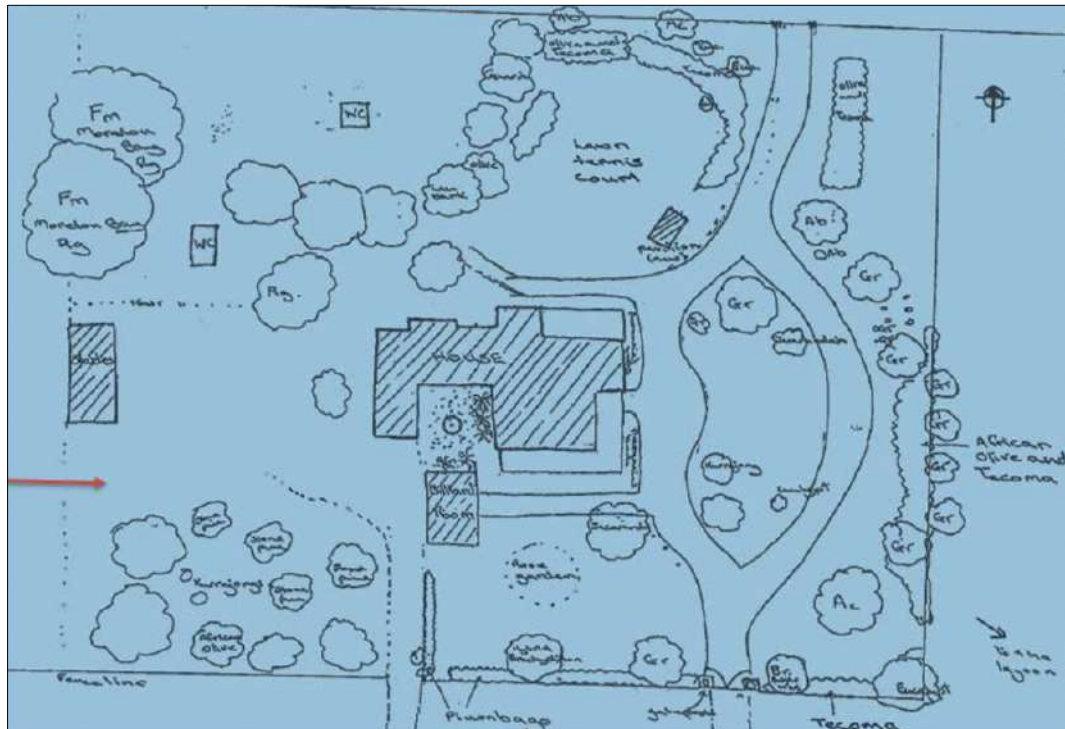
Plan showing the layout of the homestead group of buildings and garden. The barn, since reunited with the site lies to the west of the stables (out of this sketch plan).
